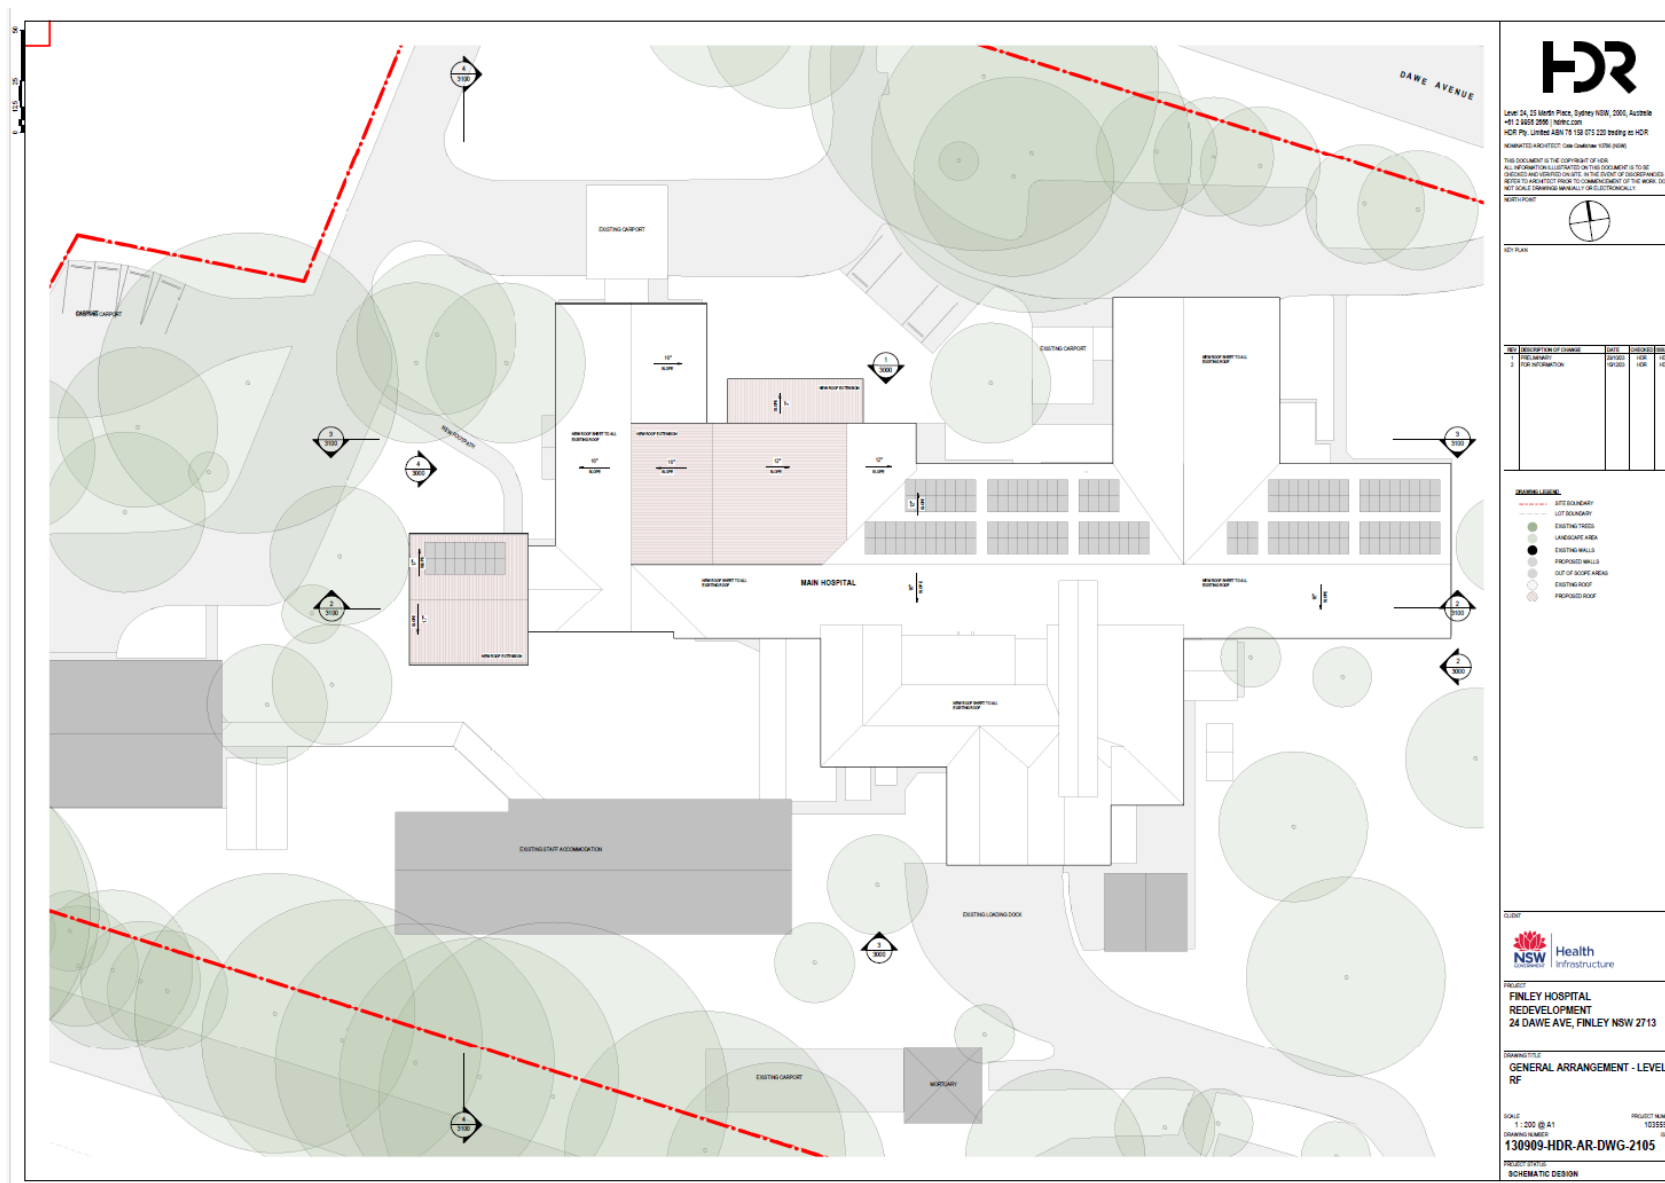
Development plan roof level (supplied by NSW Health Infrastructure)
